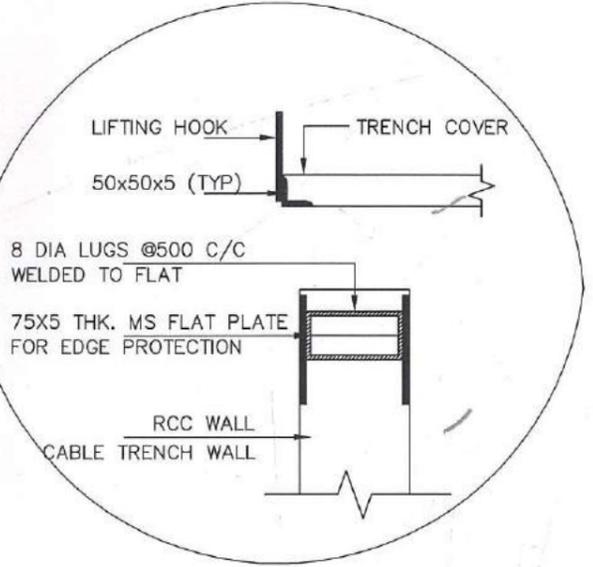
DETAIL OF TRENCH COVER SLAB FOR SECTION 3-3 & 4-4
